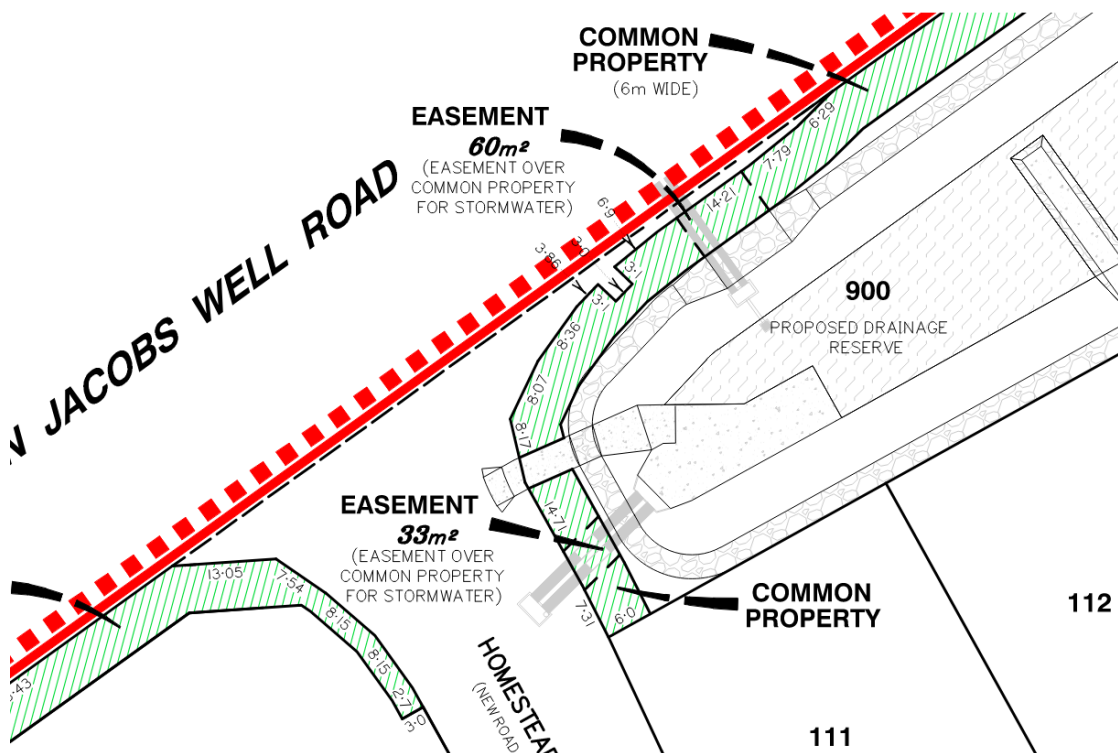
Proposed easement locations facilitating stormwater infrastructure in Common Property
